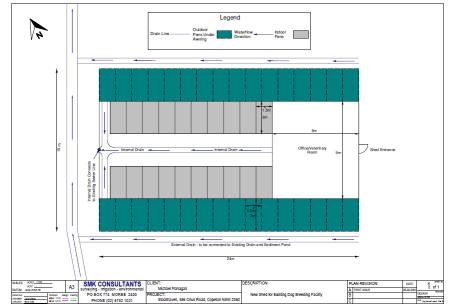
New Shed for Existing Dog Breeding Facility - Dog Kennel Layout
